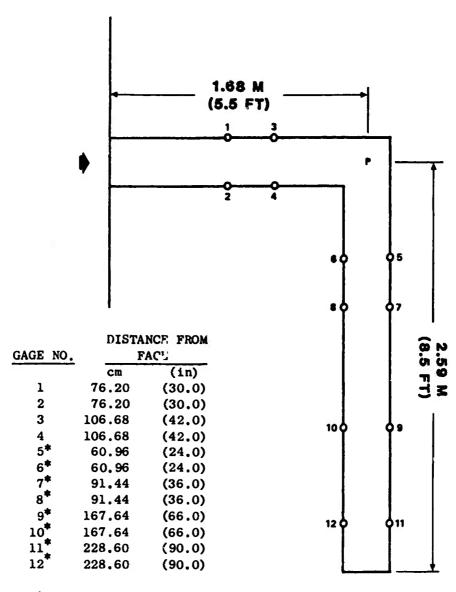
Dimensions and gage locations of "T" tunnel structure with square cross-section.
